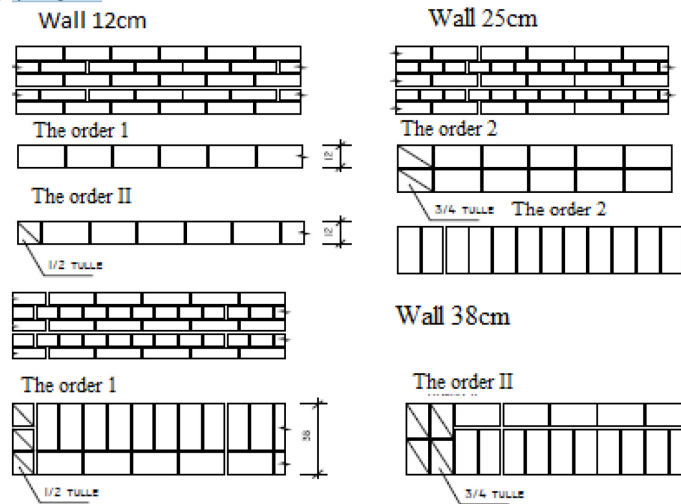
Walling technique (Source: Papanikolla, 1973)
